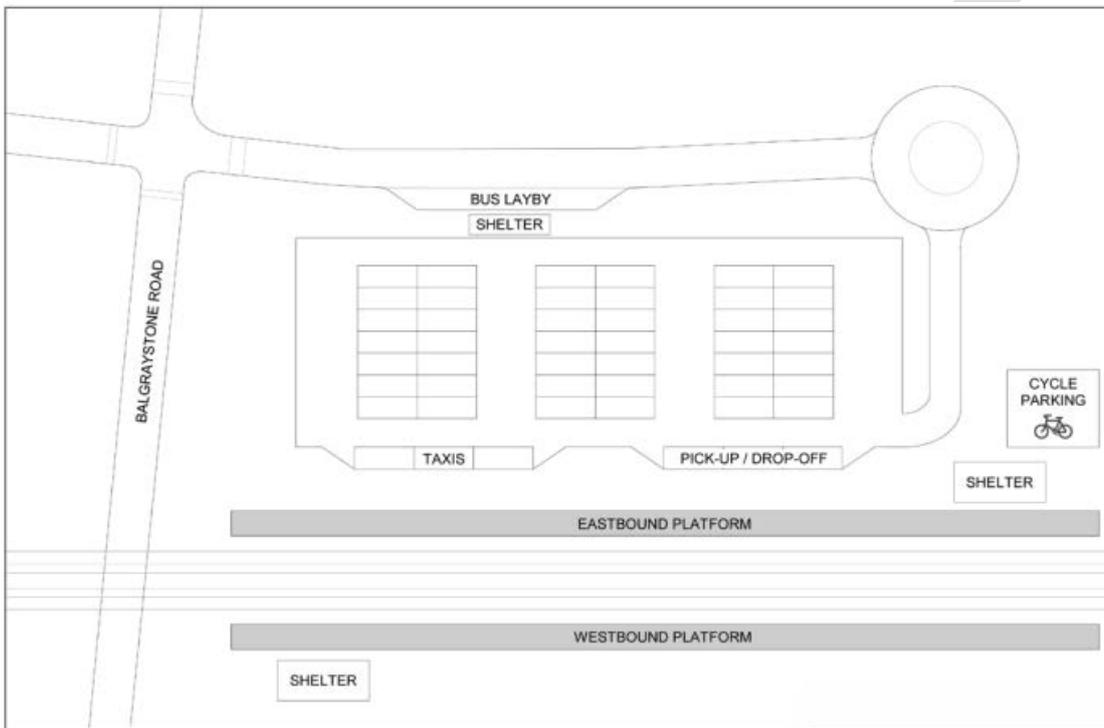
Preliminary Design of the Barrhead South Rail Station (Local Development Plan Supplementary Planning Guidance: Barrhead South Master Plan (Geddes Consulting on behalf of East Renfrewshire Council, Edinburgh, June 2015))
